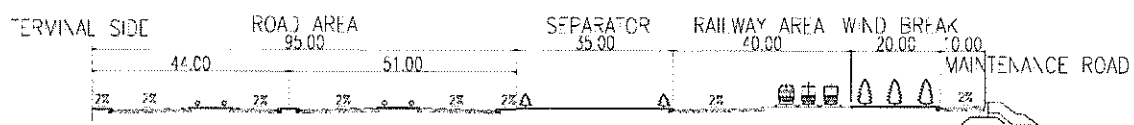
Typical Cross Section of Road and Railway behind Terminal (Future)
